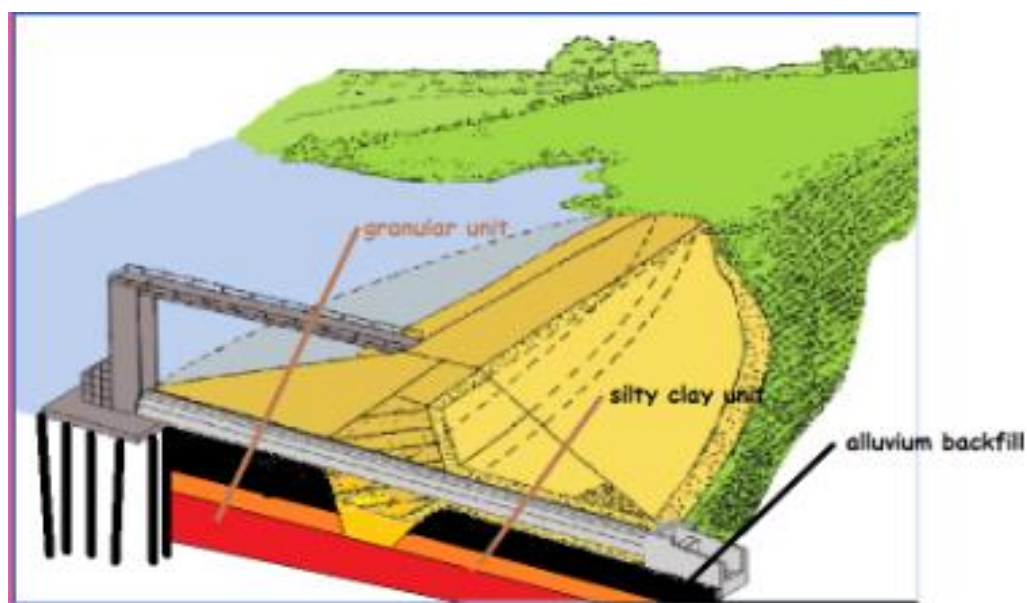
systematic diagram of conduit outlet and the foundation material
